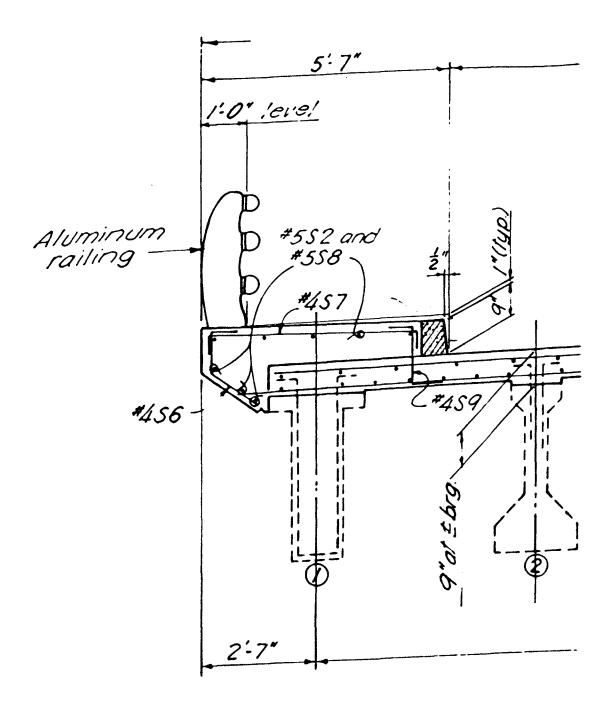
Aluminum Tri-Rail bridge rail with sidewalk (continued).
